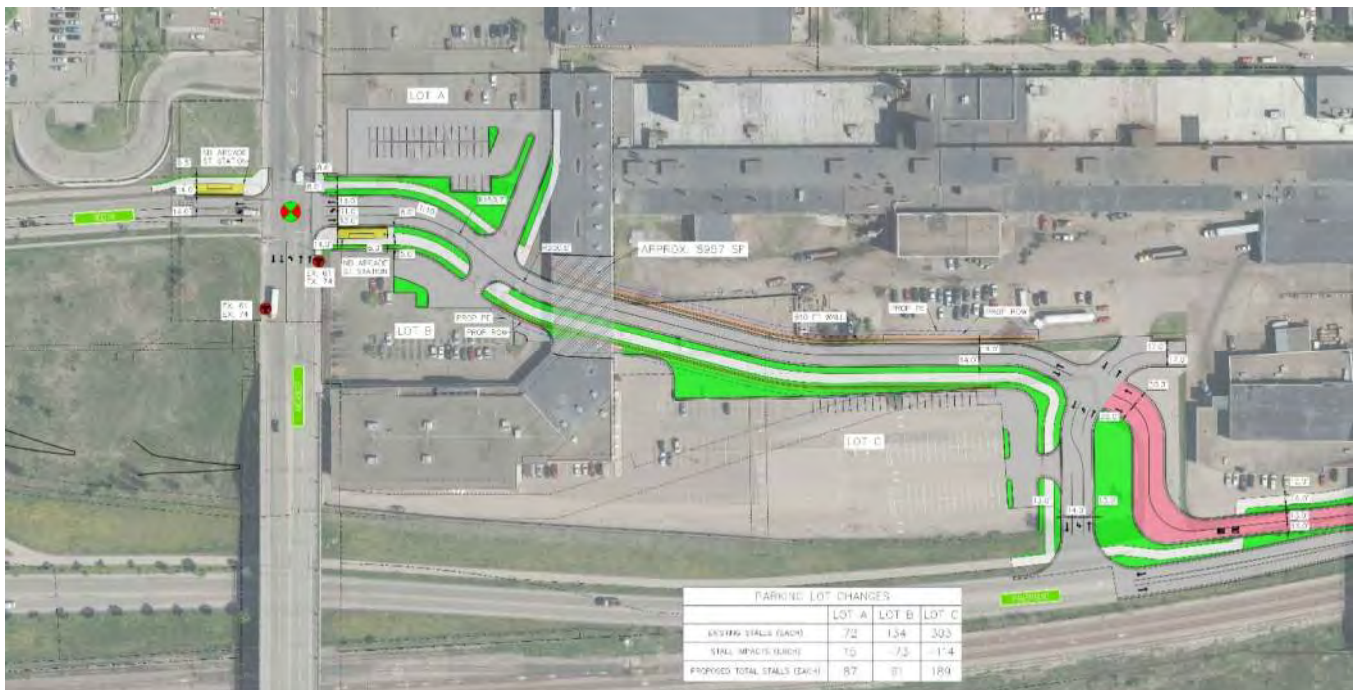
Alternative Concept B1.1 Layout (stations located kitty-corner at Arcade/Neid intersection)
